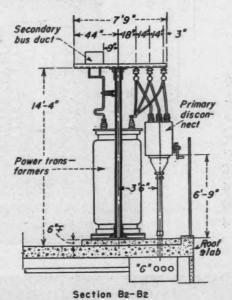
Typical section of a roof substation transformer bank showing primary feeder termination in pothead disconnect and secondary bus duct which extends through wall of adjacent switchboard room.
